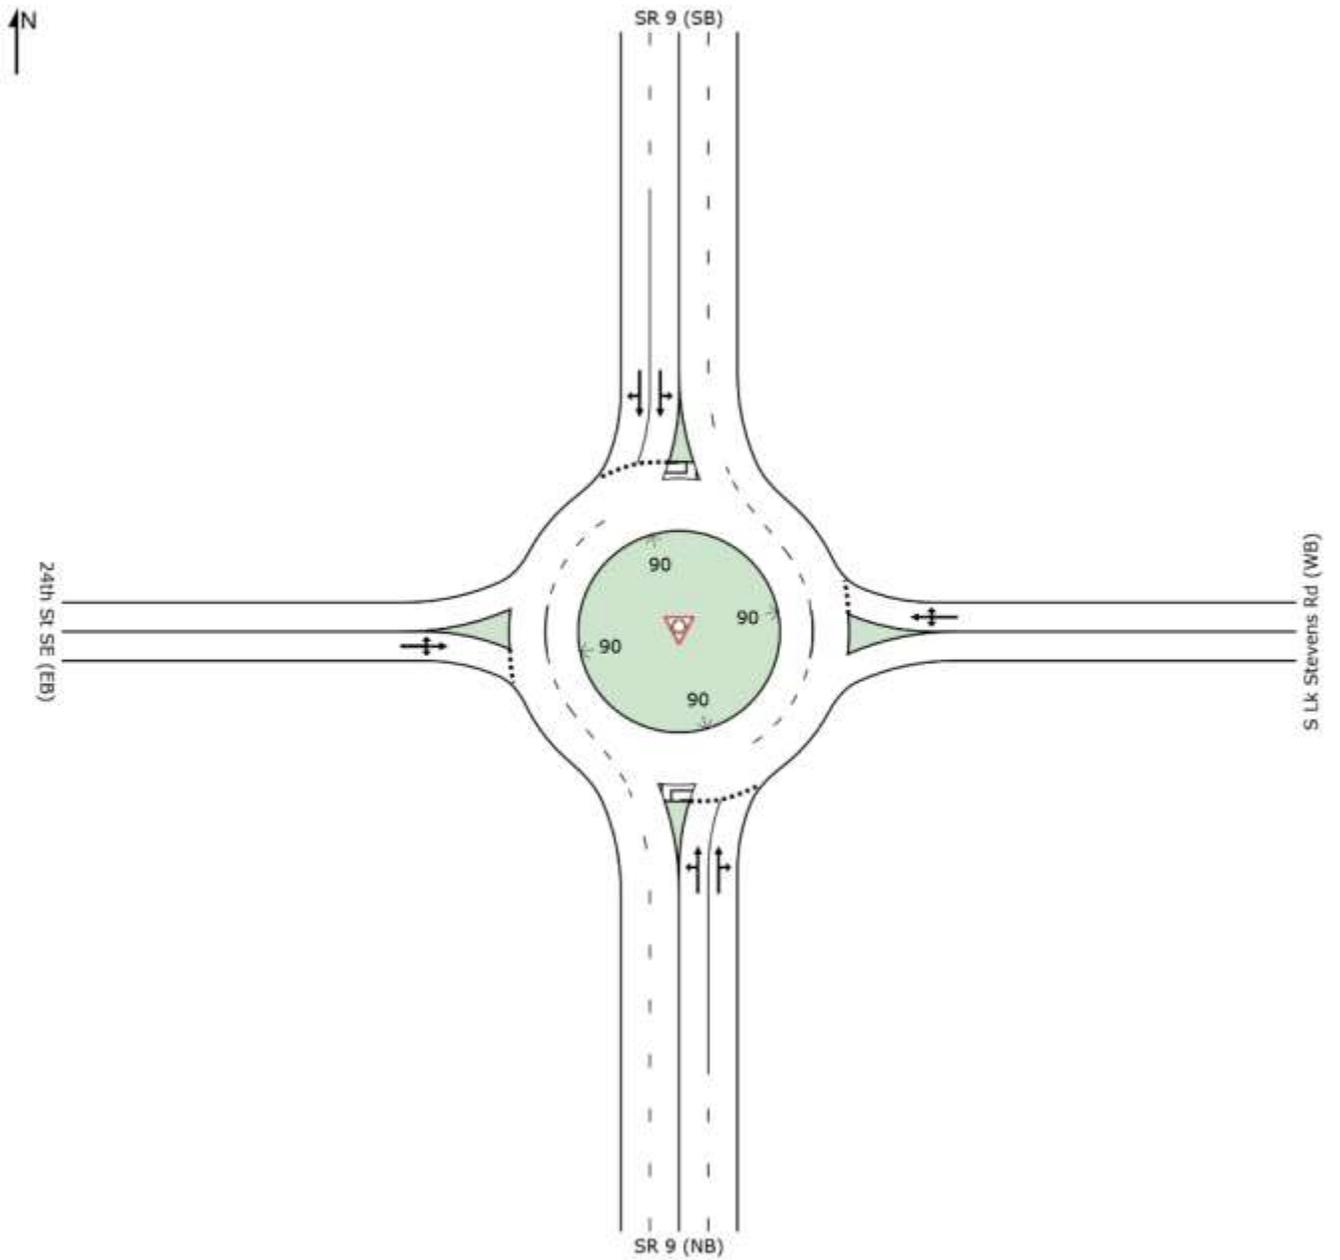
SR 9 & 24th Street SE Alternative B Conceptual Layout
